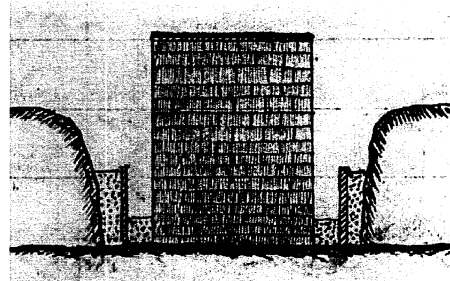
Installation of the transit telescope pier (after Newcomb, n.d.:10).
